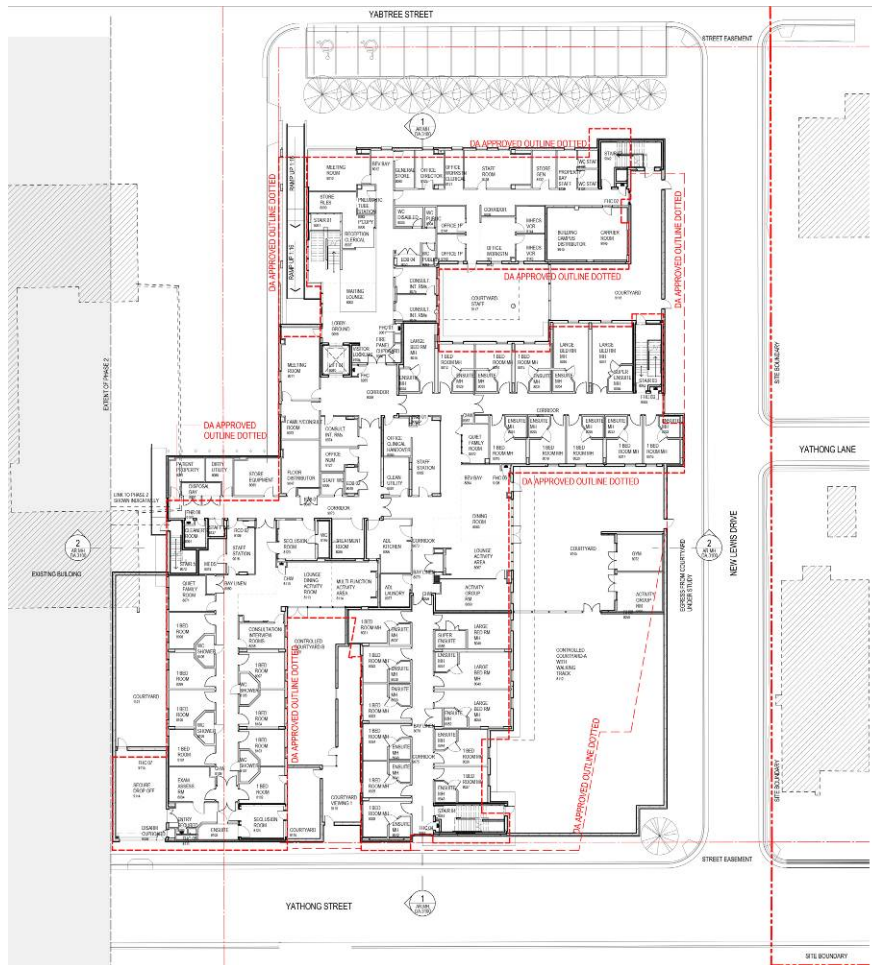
Modified Ground Floor Plan overlaid with approved building footprint (Source: Woods Bagot)
